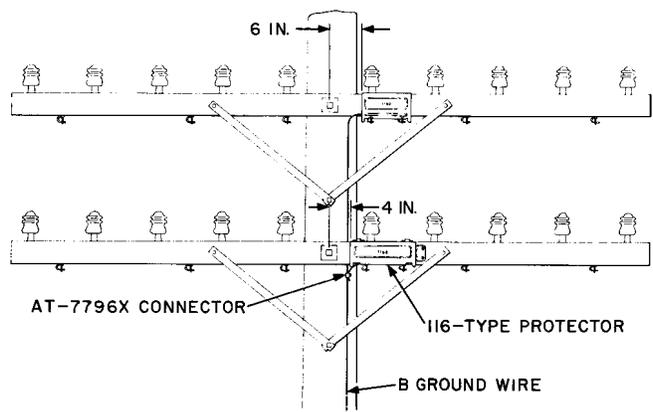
Mounting 116-Type Protector on Crossarm Terminal
